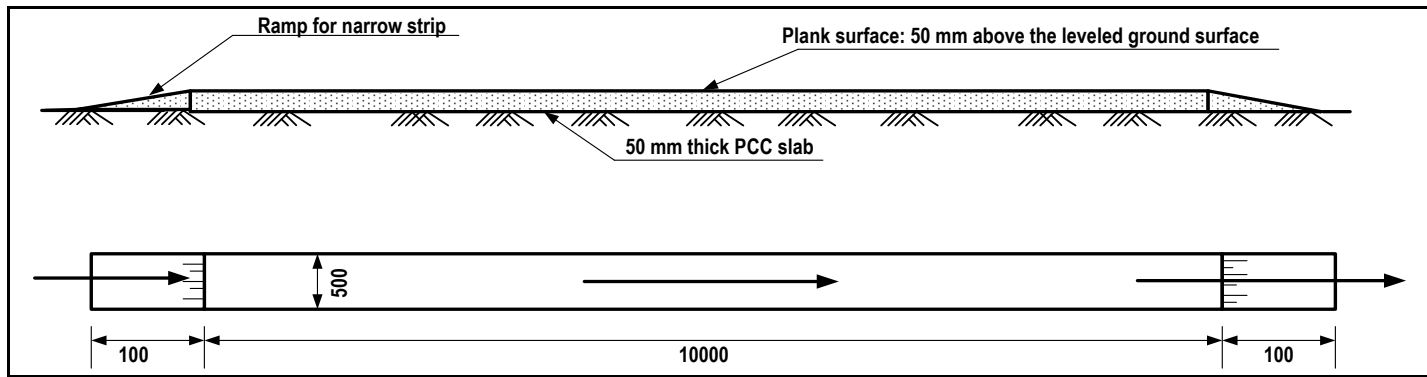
Narrow Plank test: PCC cast in-situ slab/Wooden Plank
